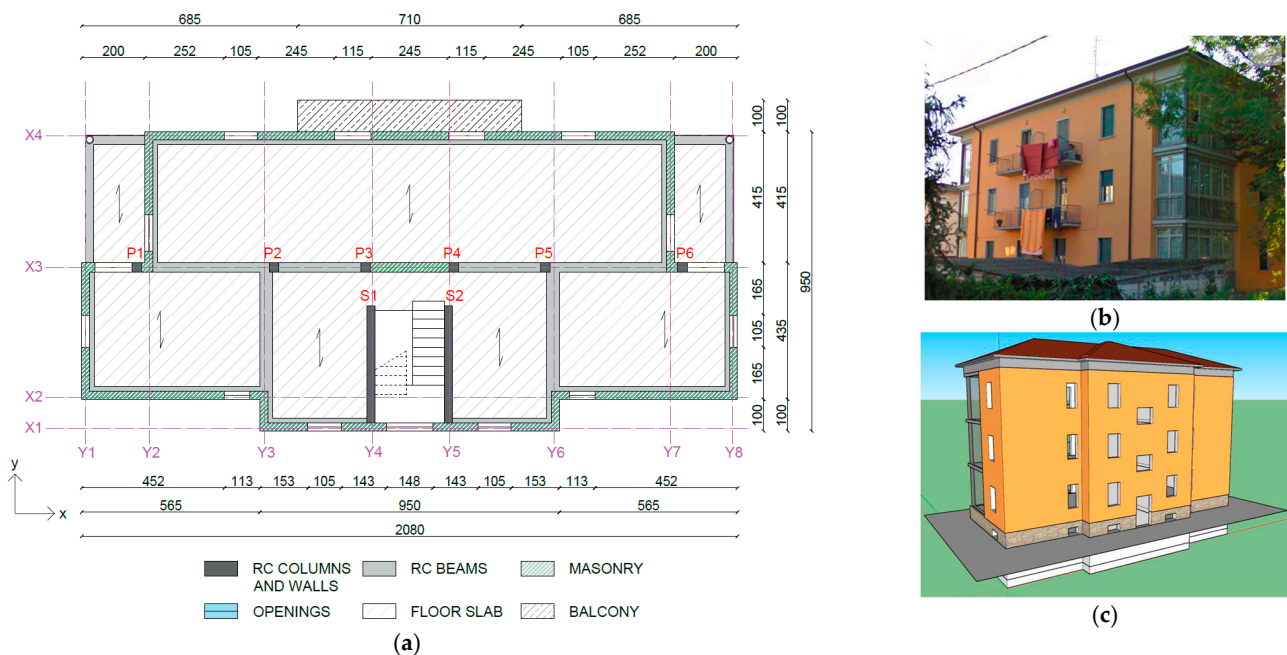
(a) Plan of a reference floor. Dimensions are given in cm; (b) pictures of the reference building; and (c) 3D views of the reference building.
